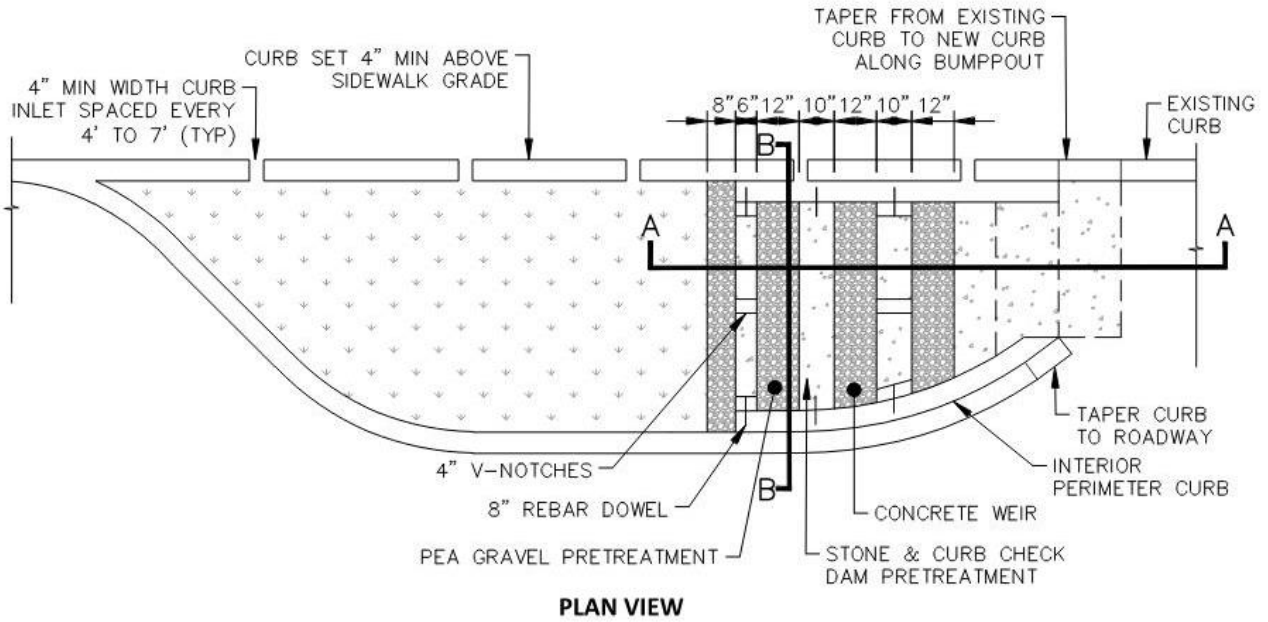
Pretreatment for Bioretention Bumpouts – Stone and Curb Check Dam
